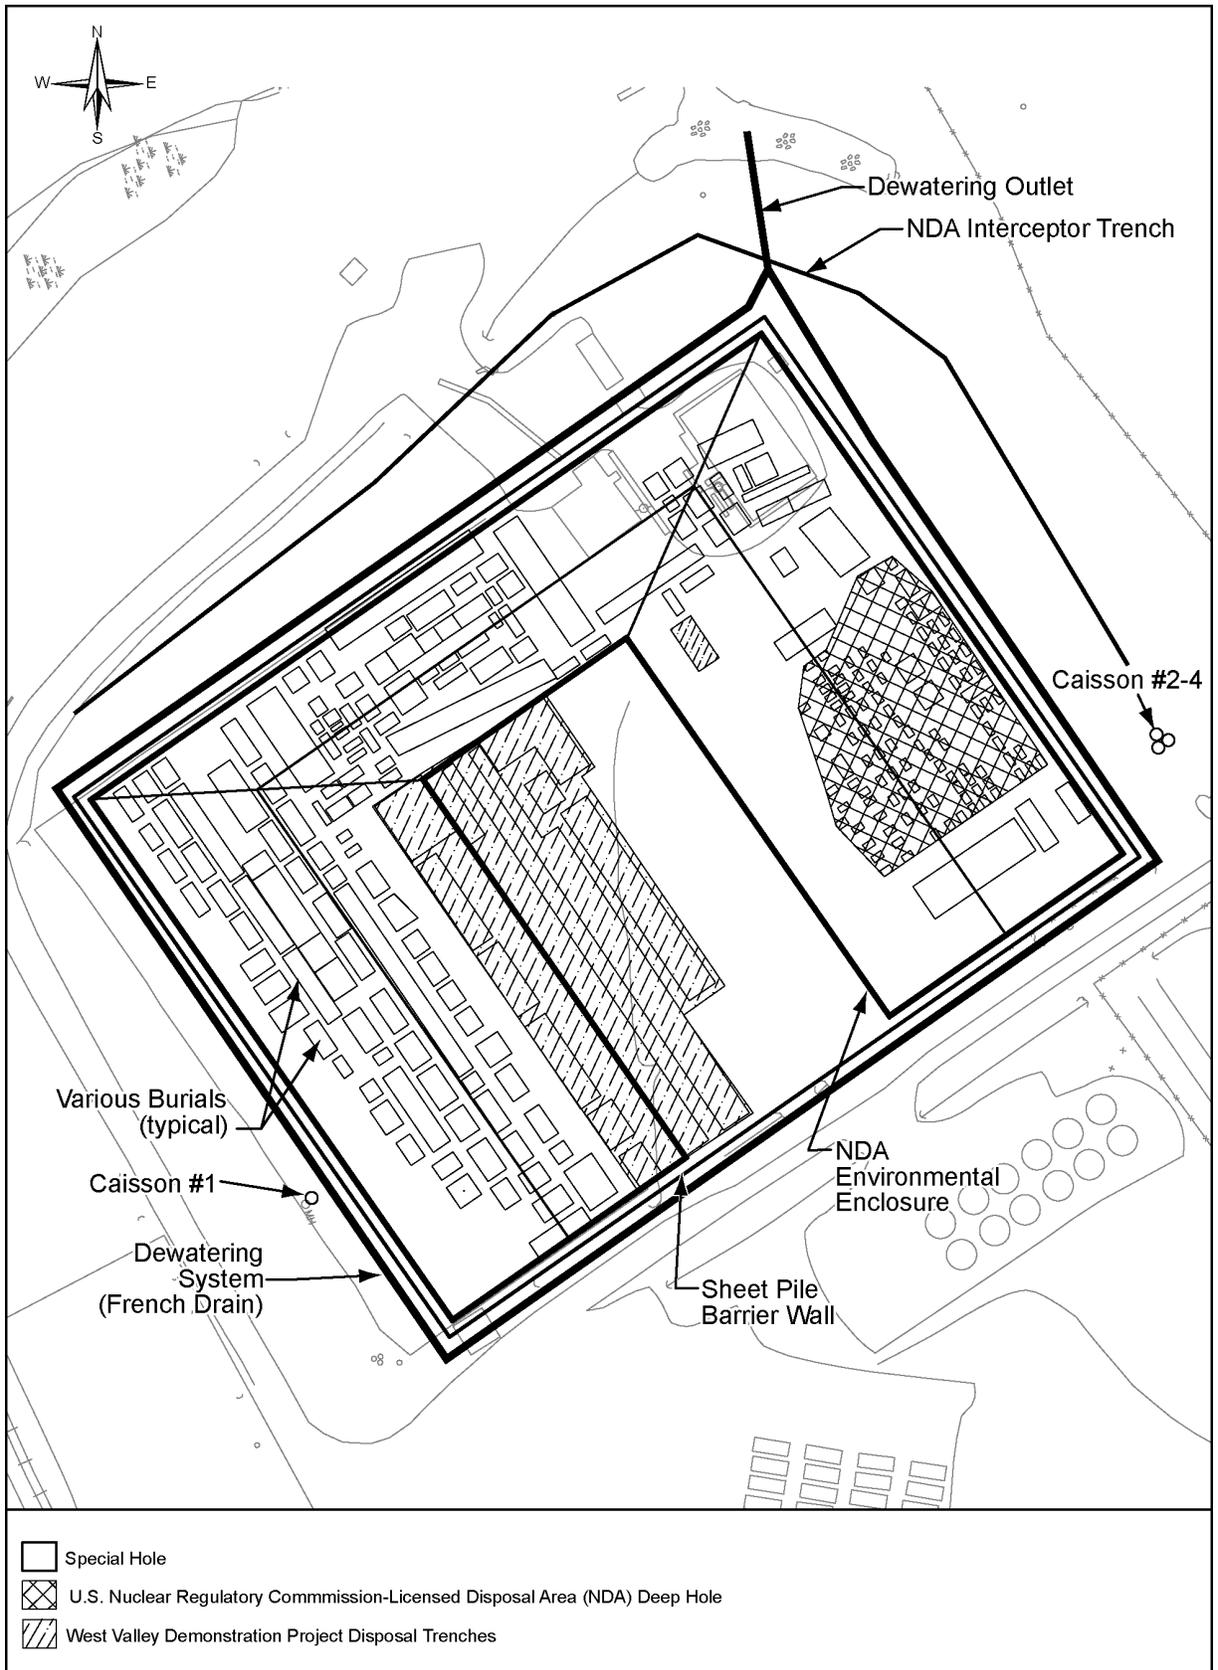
Conceptual NRC-licensed Disposal Area Barrier Wall and French Drain Layout
